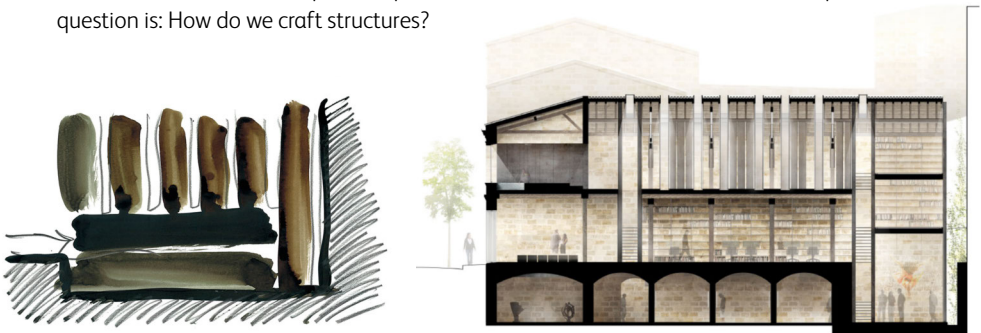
+5: Gallery, atelier and house, abstract drawing (left) and section (right) depicting “Defining the Essential,” Bordeaux.
